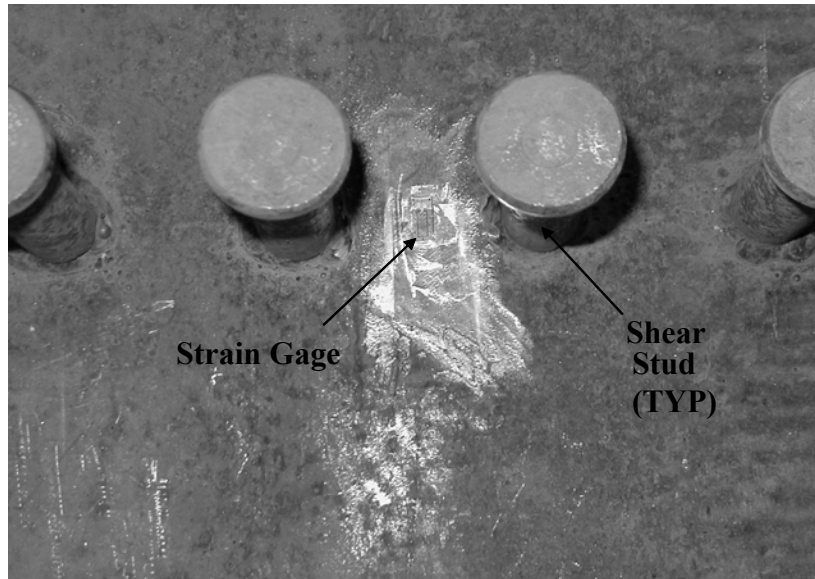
Strain Gage on Top of Girder (F-S-7-C-6)
